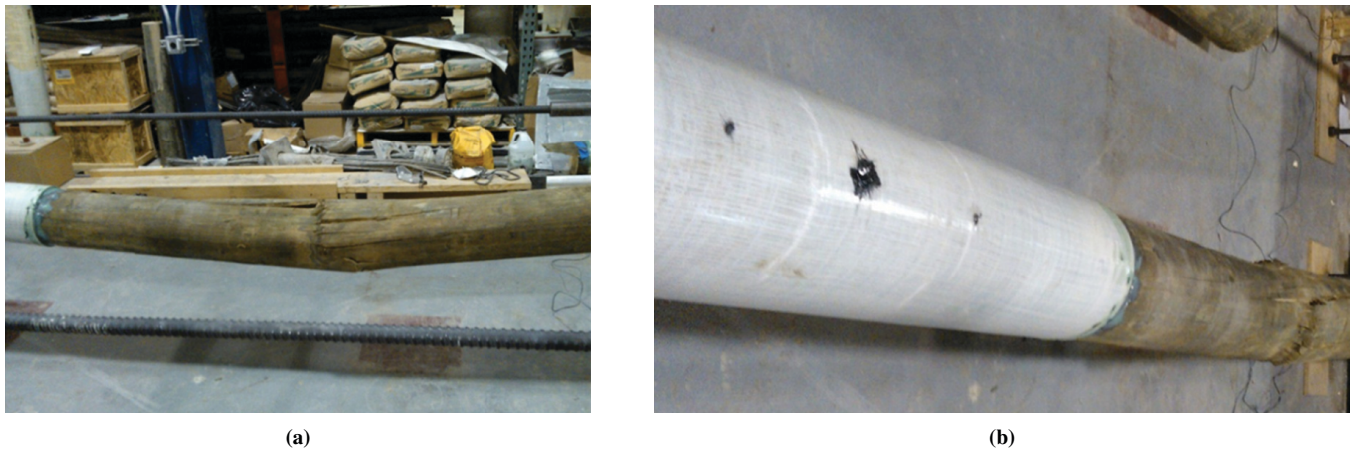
Failure of Specimen 5 (damage 2-in. deep filled with resin and gravel): (a) damage away from repaired section and (b) insignificant damage to FRP jacket.
